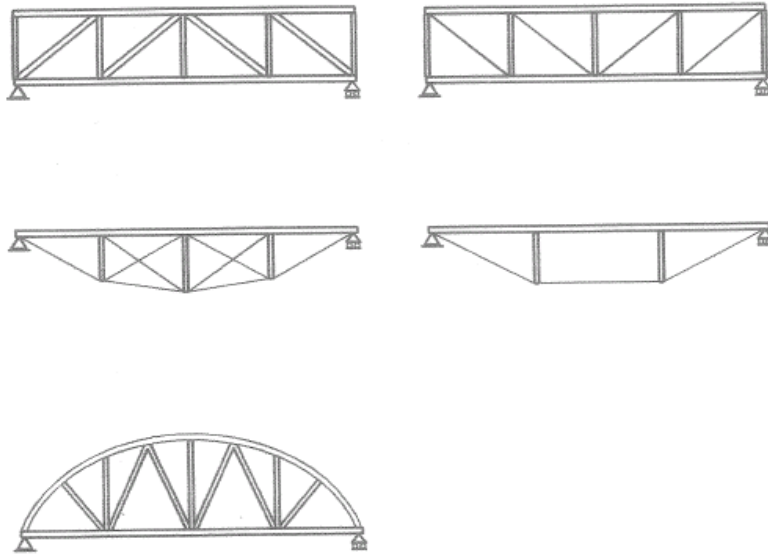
Examples of timber trussed bridges (Bellumat, 2000)
